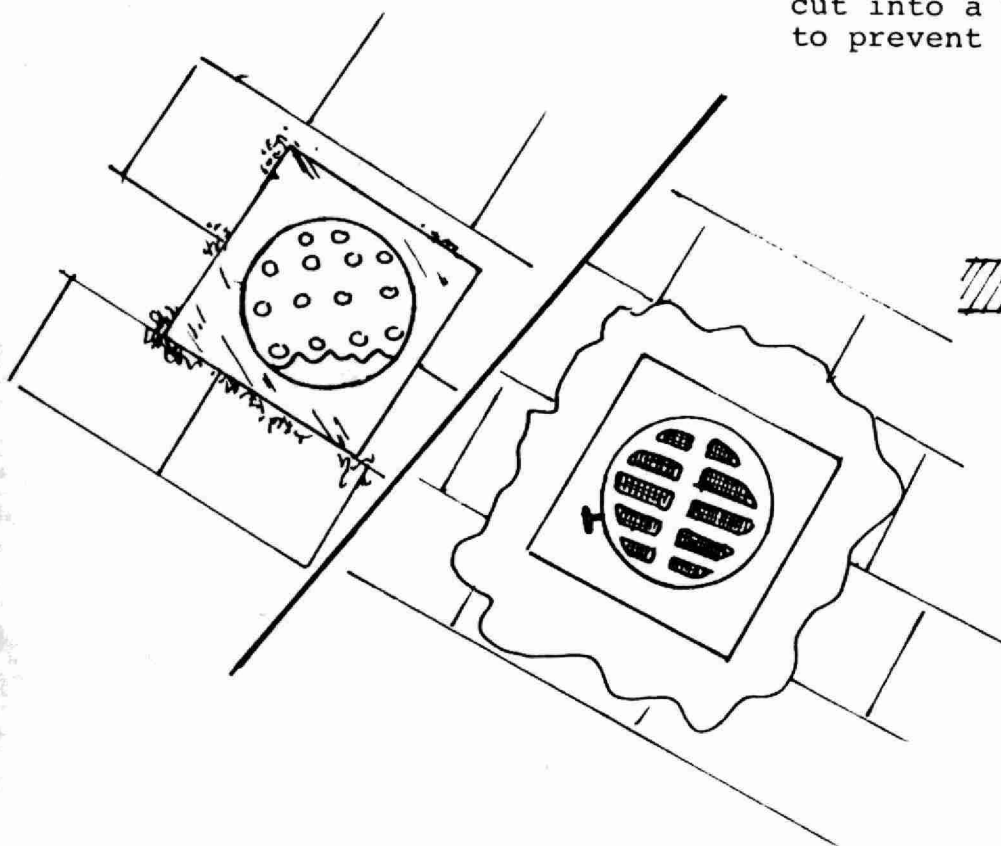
REPAIR AND SCREEN FLOOR DRAINS
